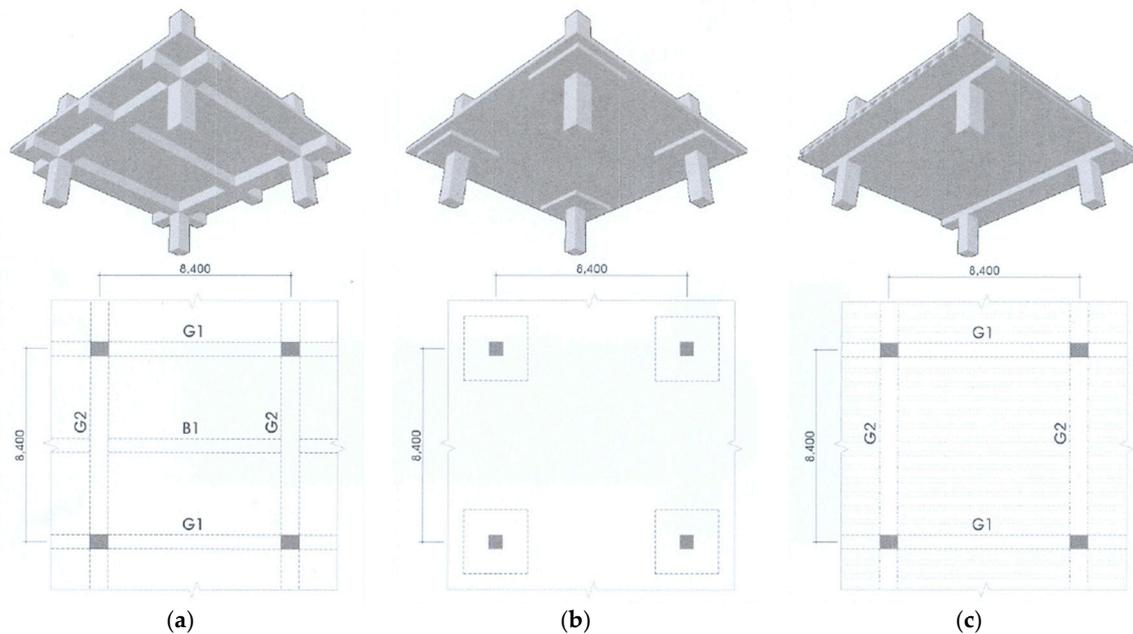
Schematic of the slab systems in a building: (a) Ordinary reinforced concrete slab system, (b) Flat plate slab system, (c) Voided slab system
